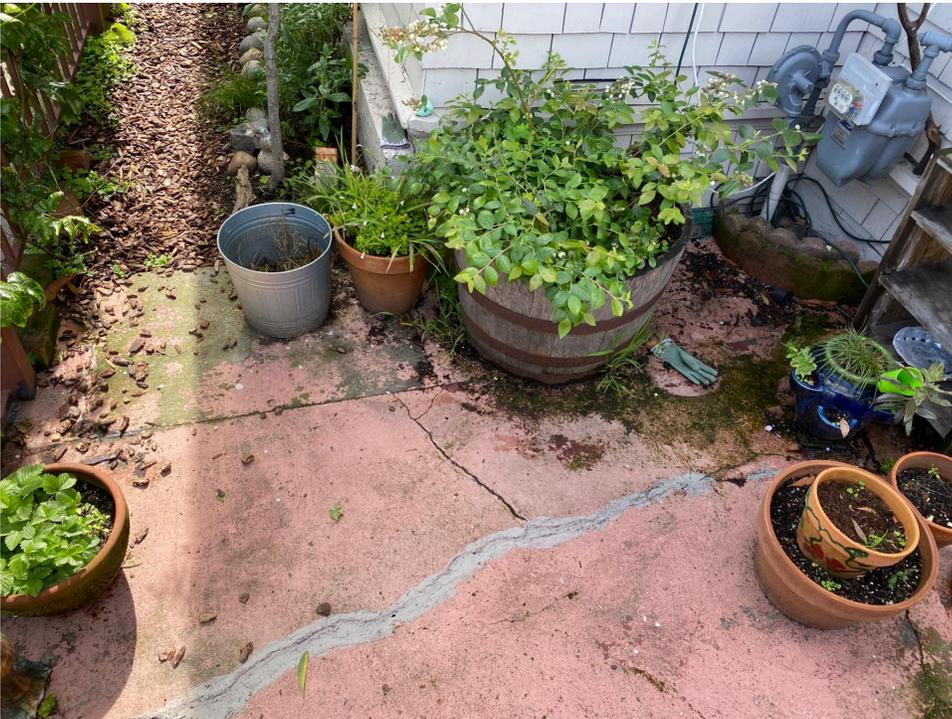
shows cracks in the concrete surrounding the house, which has allowed water to seep into the foundation and basement causing further deterioration to the foundation. The plan will be to spray to kill the roots that have been causing damage to the concrete, remove all roots, clean, sand, reseal, and paint the concrete, or replace completely if necessary.
